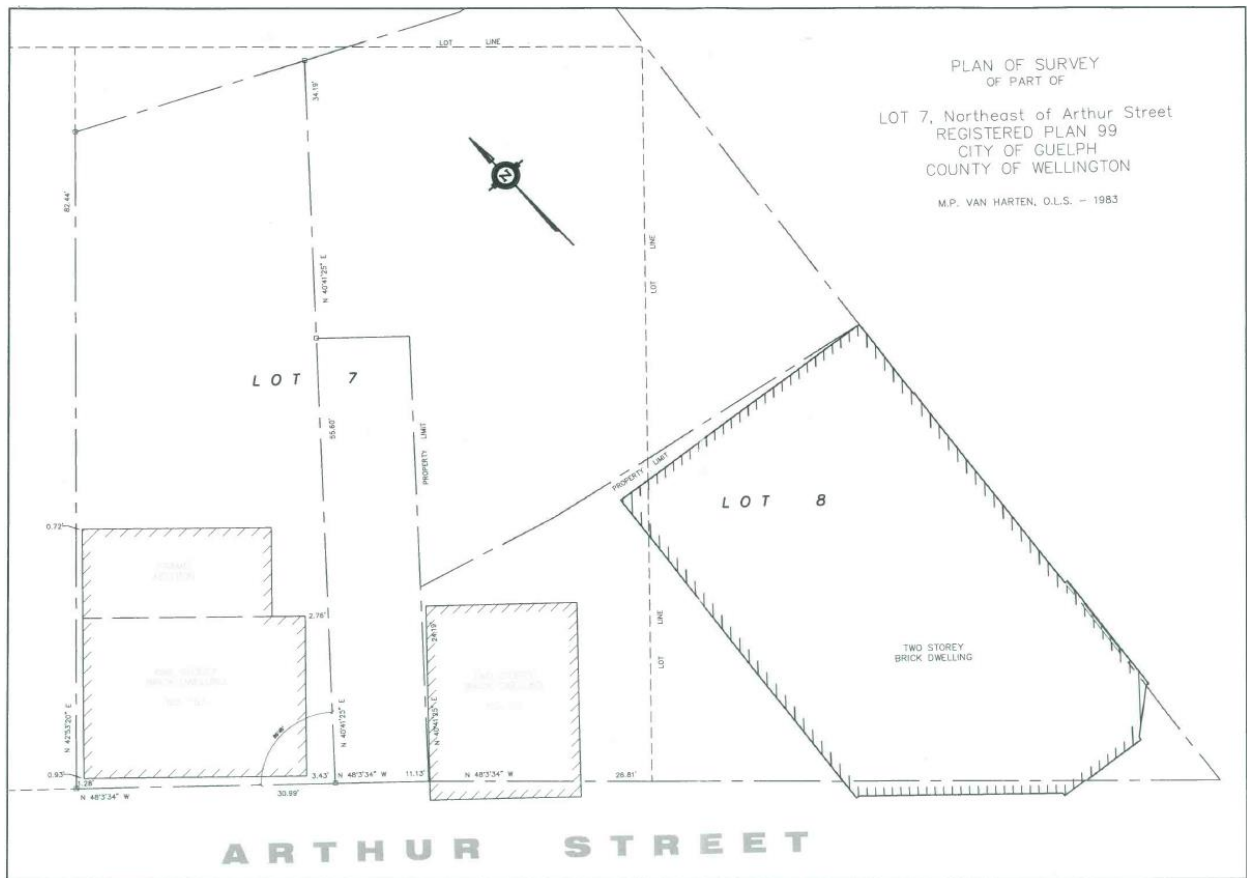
Plan of Survey. (M. P. Van Harten, O.L.S., 1983)
